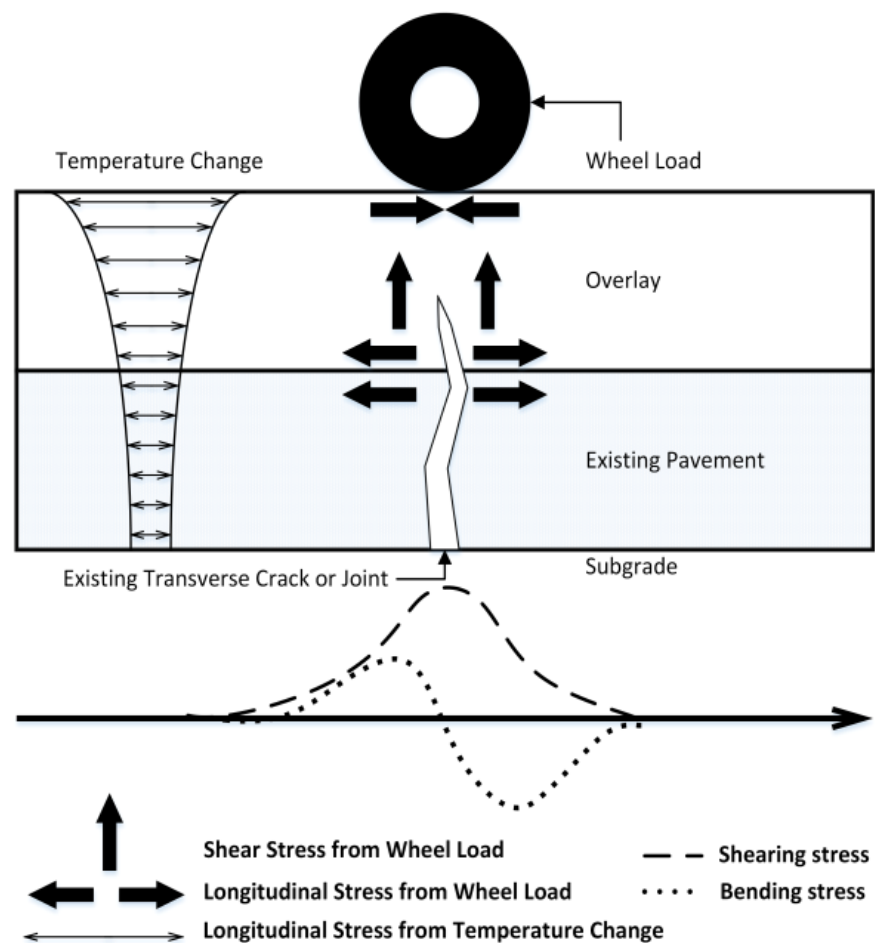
Reflective cracking mechanism in flexible pavements [170].
